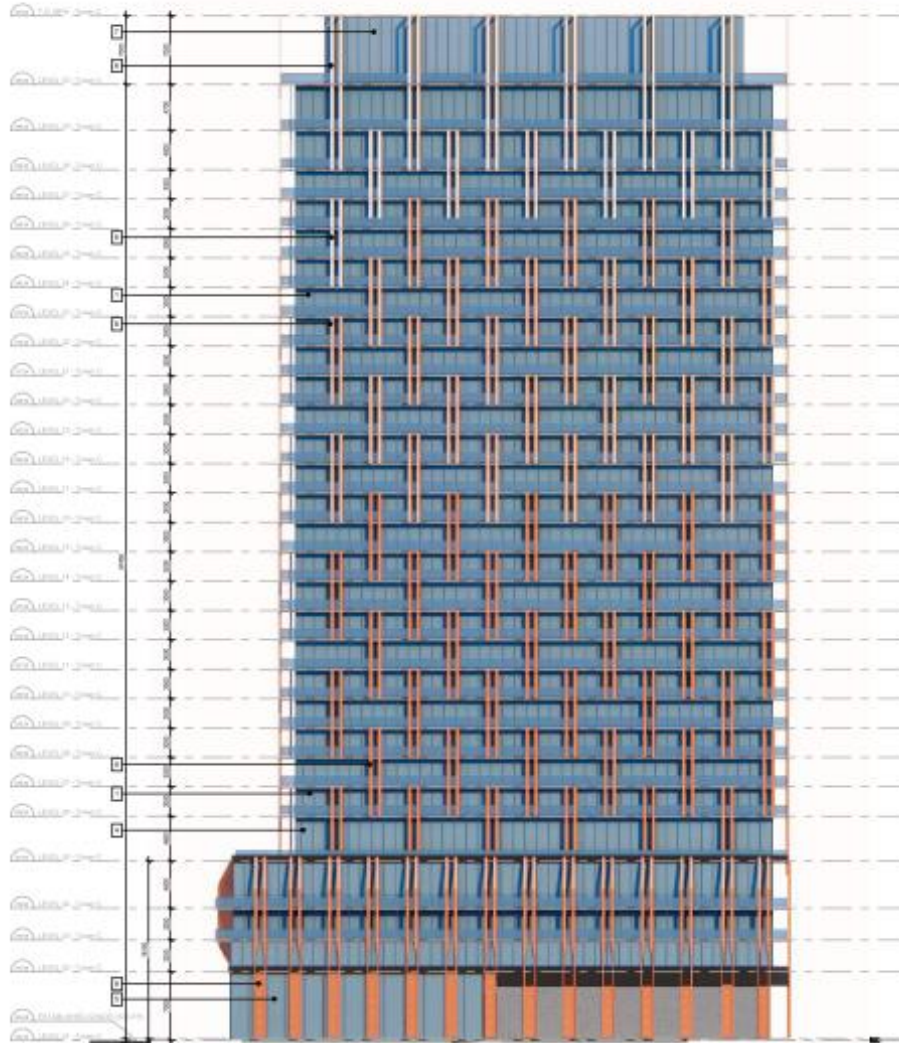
Conceptual Elevations – East Elevation – Towers A, B, and C
